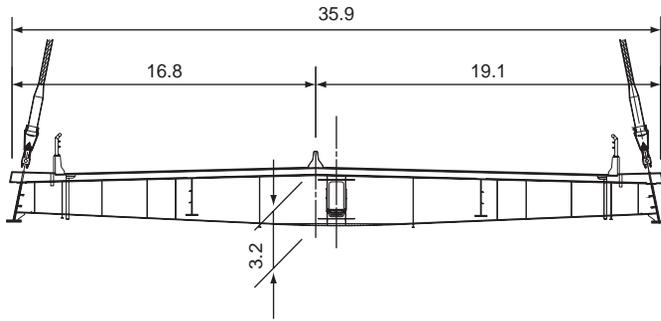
Twin girder composite deck – Industrial Ring Road Bridges, Bangkok (all dimensions in metres)
